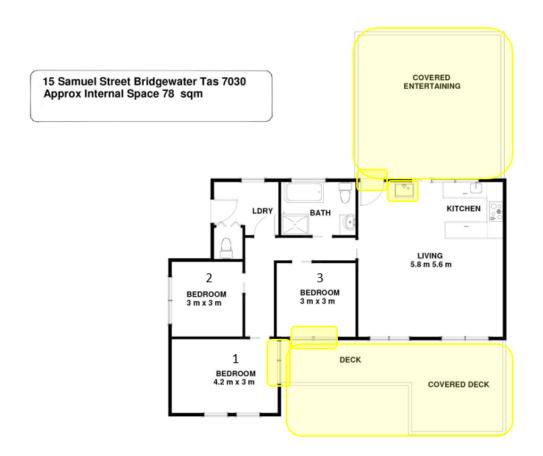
Floor plan of dwelling alterations (Floor plan source RealEsate.com Aug 2020)
